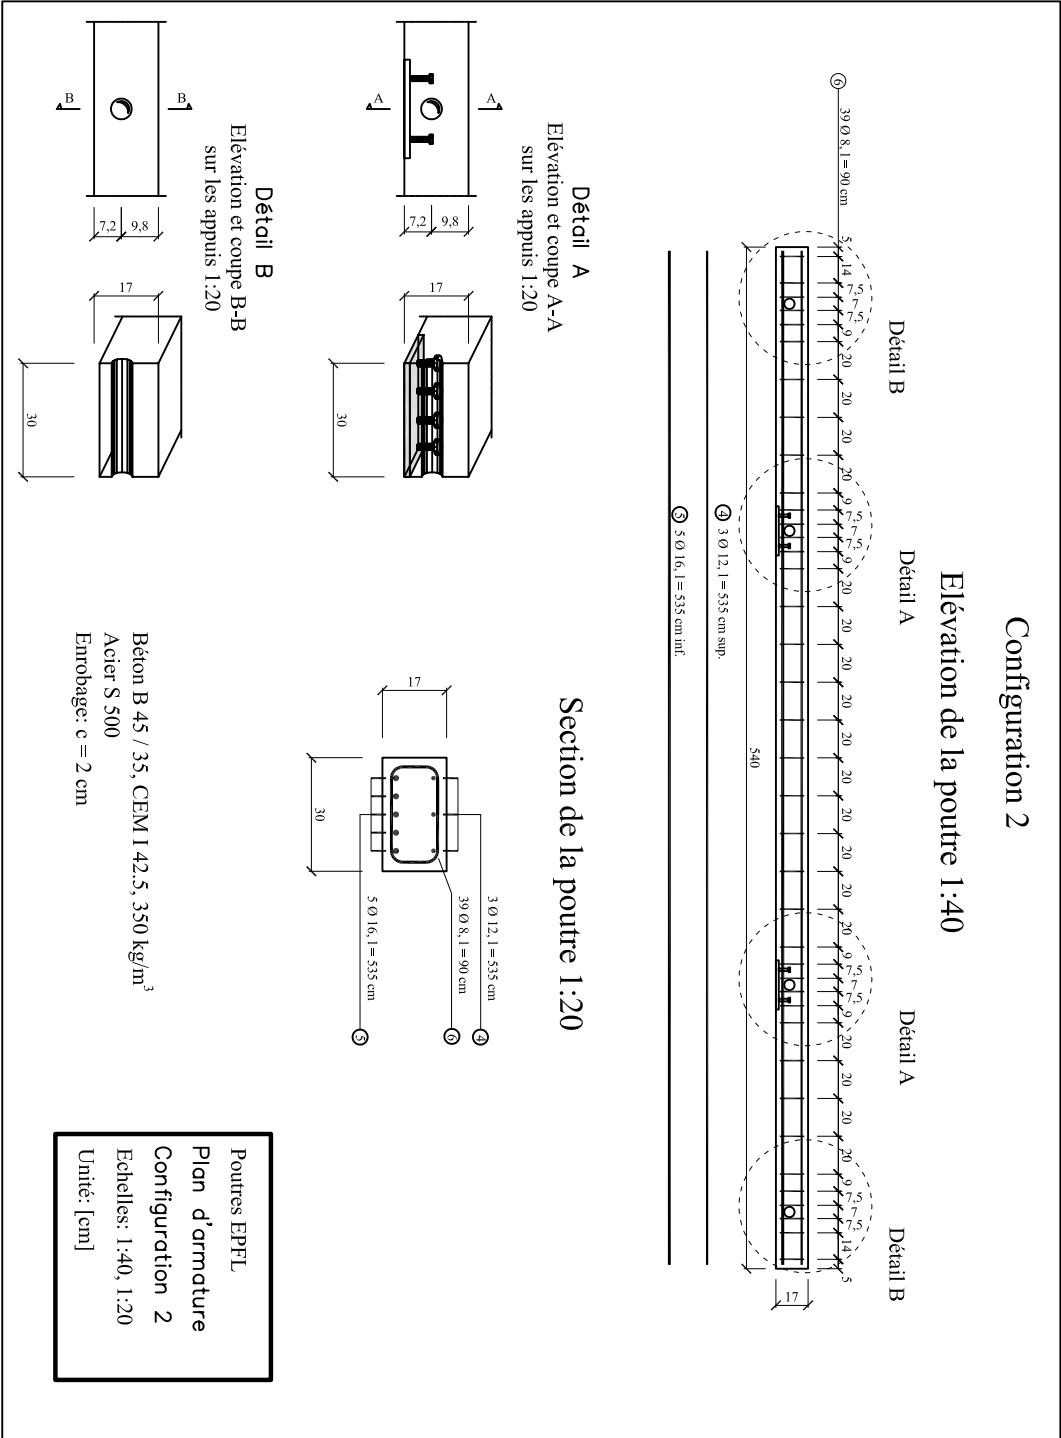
Reinforcement drawing of the concrete substrate of the statically indeterminate beams
